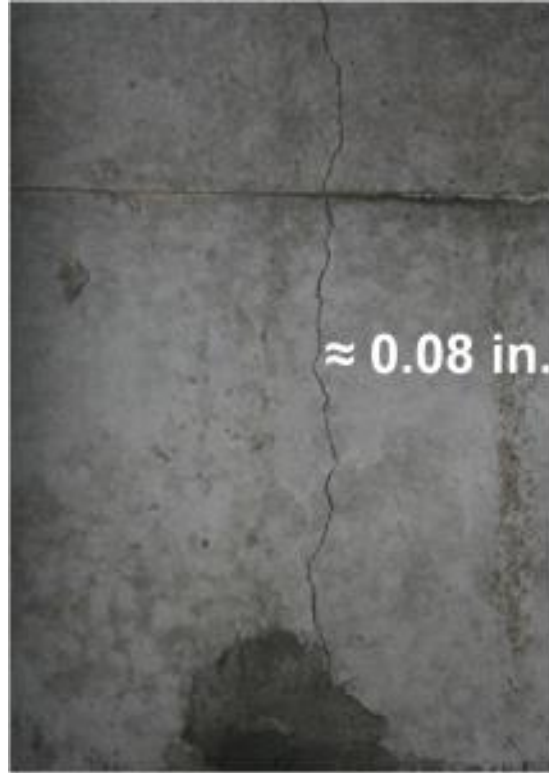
Cracking in Culvert Wall (Minton 2012)
